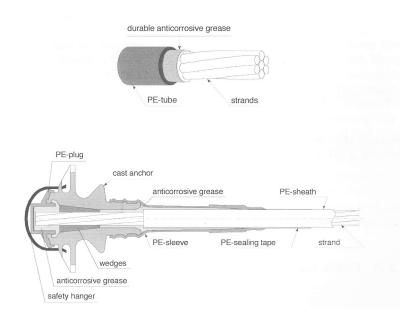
Unbonded single strand tendon (top) and solid plate anchorage of unbonded tendon (bottom) (Walraven, 2011)
